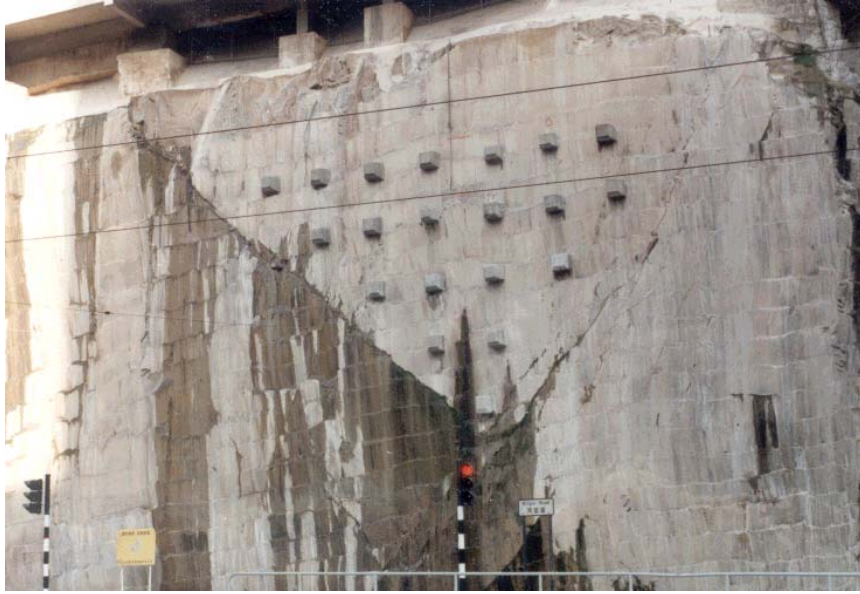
View East across King's Road towards Slope No. 11SE-A/C14 Following Installation of Rock Bolts in Large Wedge Exposed in Slope Face. Note Seepage from Joint Sets Forming Wedge. Vegetation on Slope Face in 1983 Photograph (Plate 9) Removed. (Photograph Taken by the GEO in January 1984)
